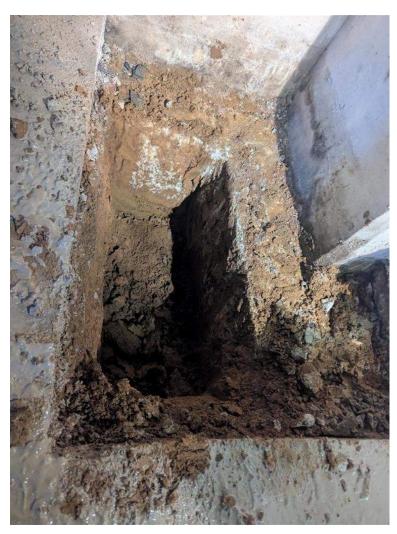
Interior Test Pit TP-1A (away bleachers). Floor slab and foundation exposed
